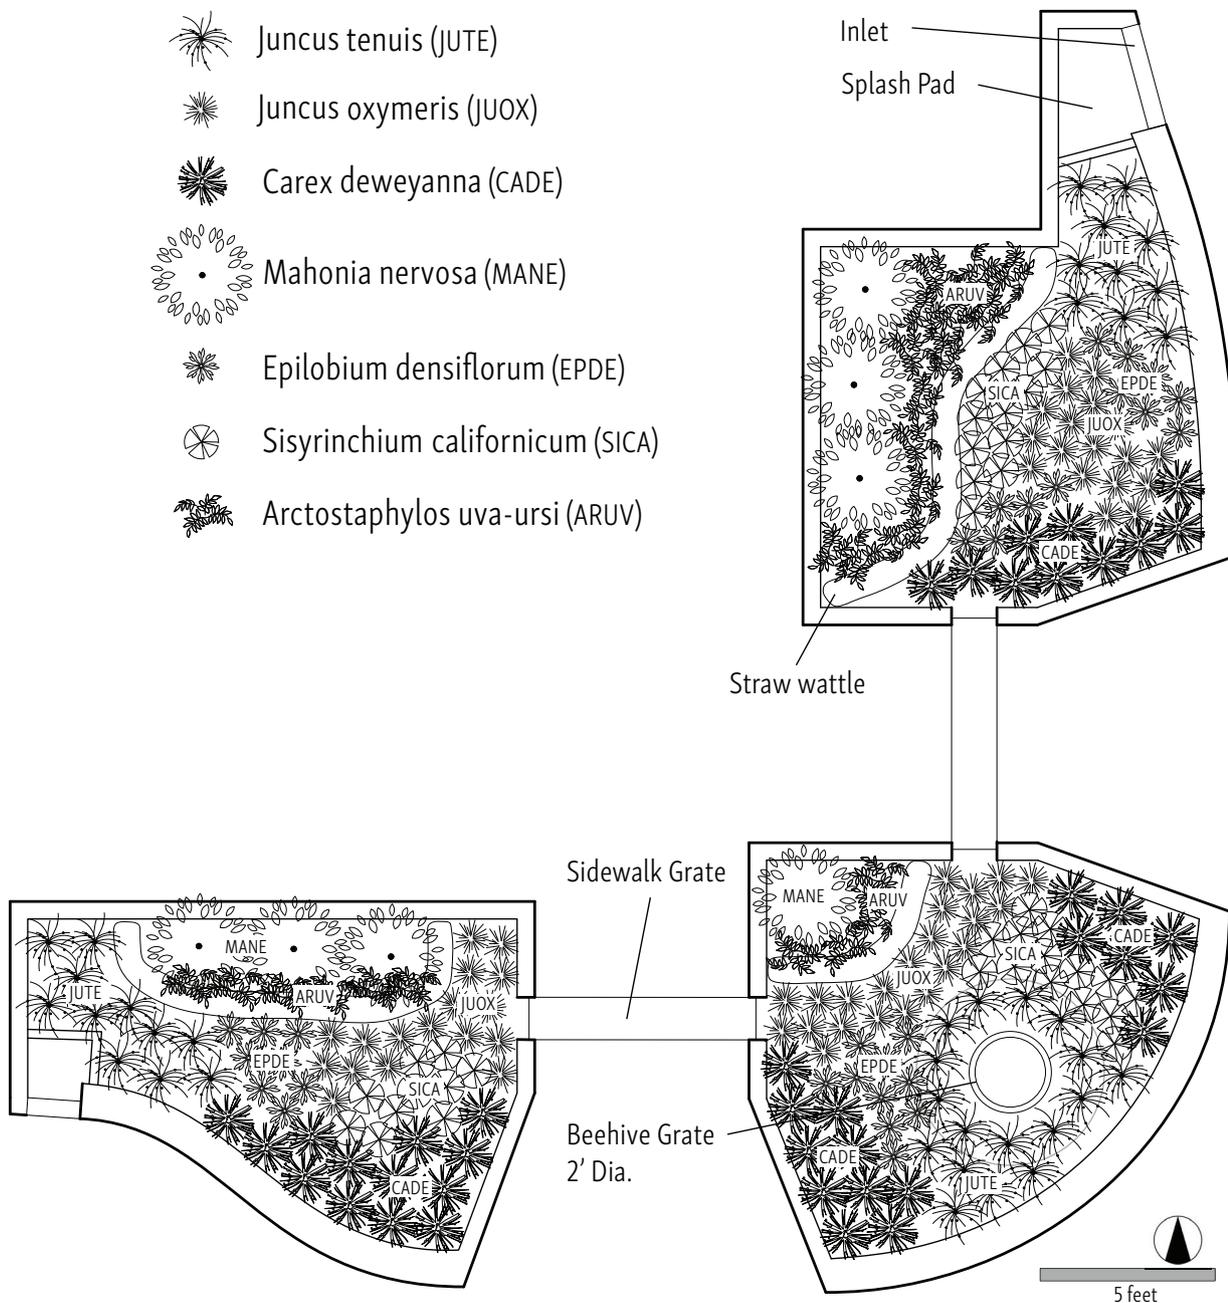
Strategy “Add Zone B” planting plan, NW corner
